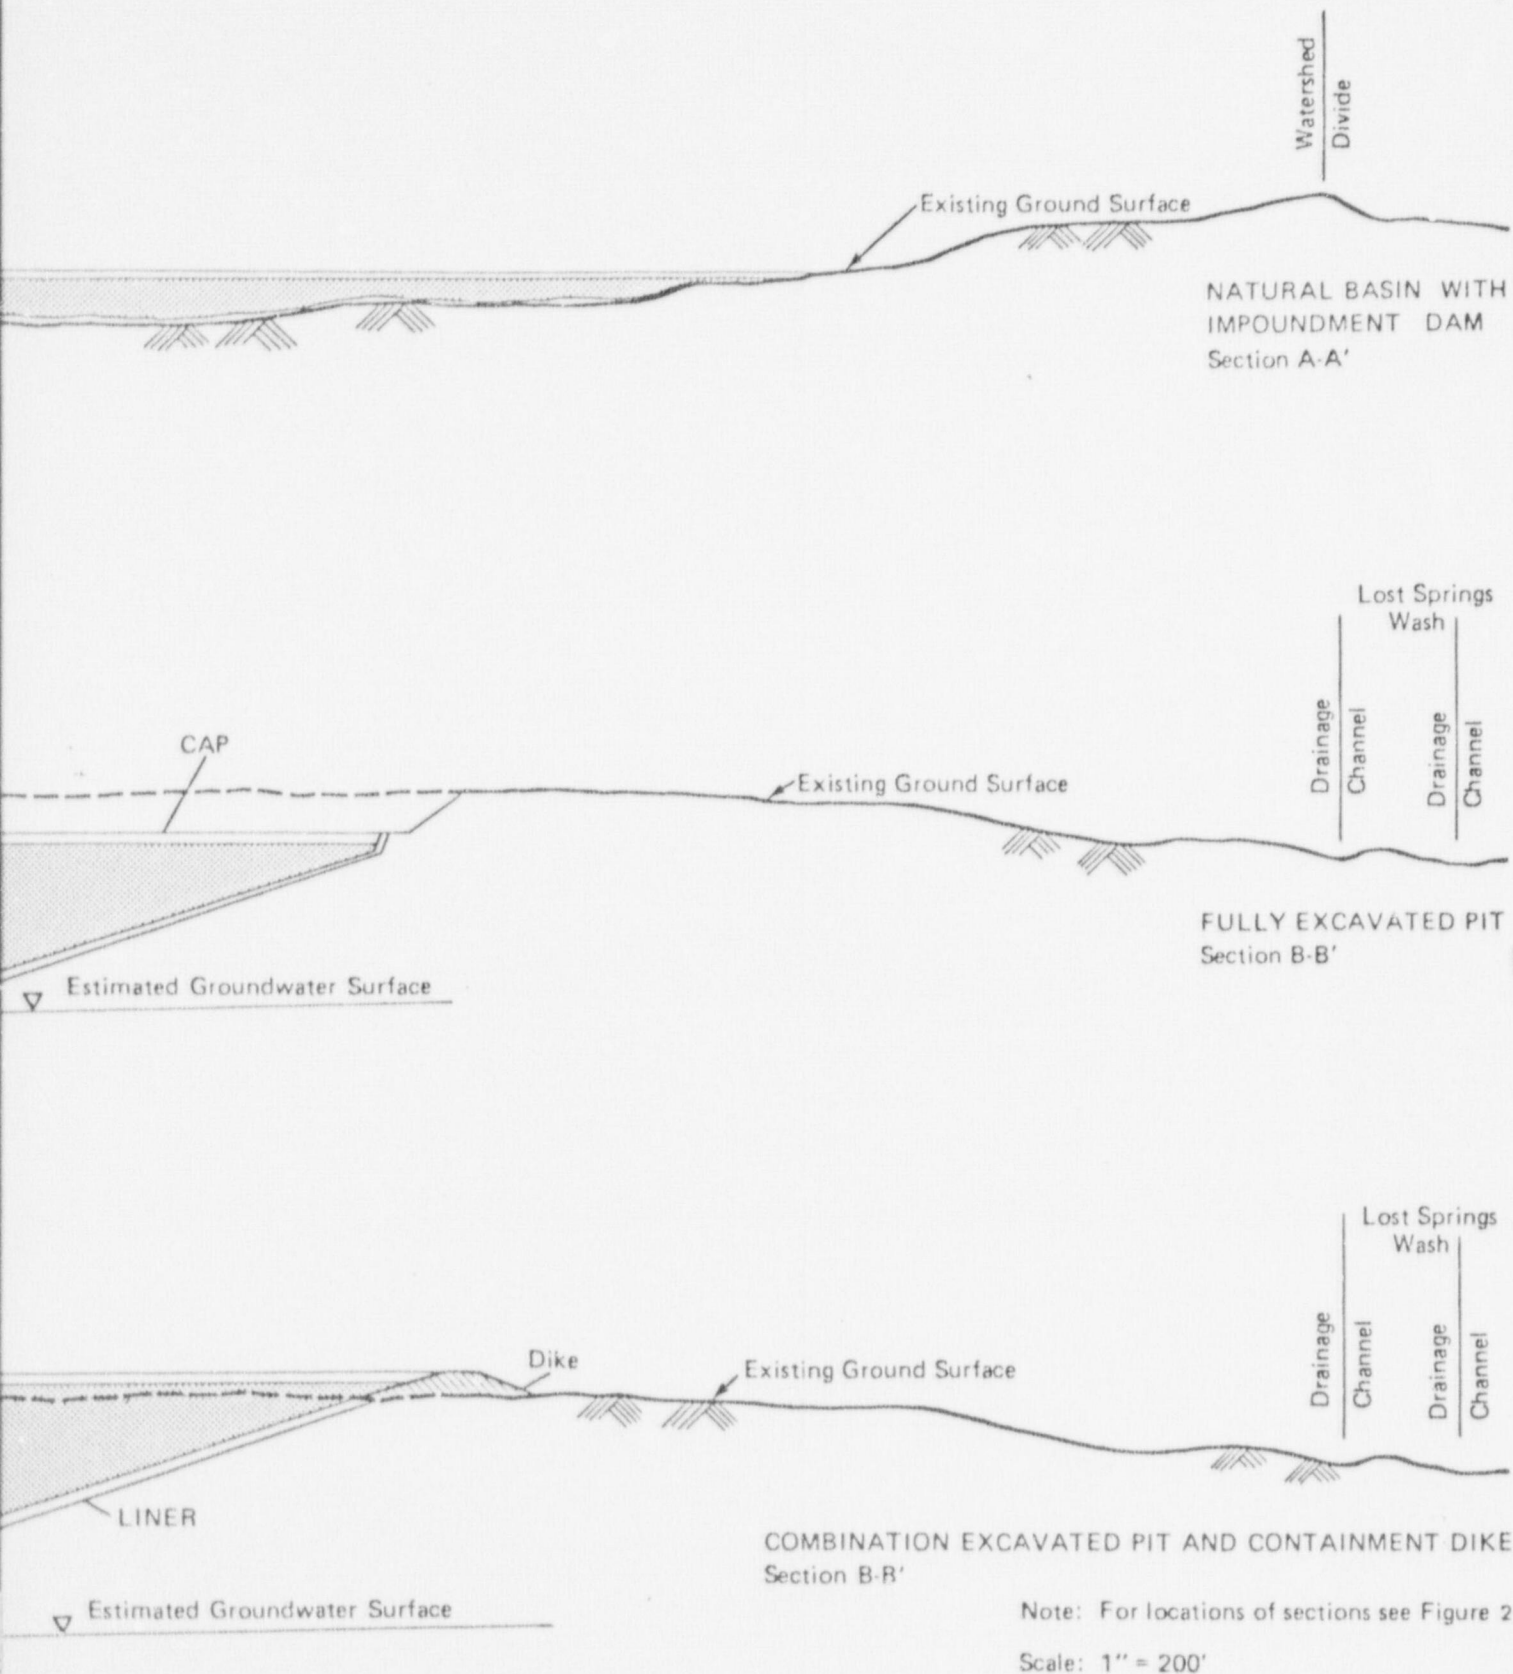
REPRESENTATIVE SECTIONS THROUGH ALTERNATIVE TAILINGS DISPOSAL FACILITIES
